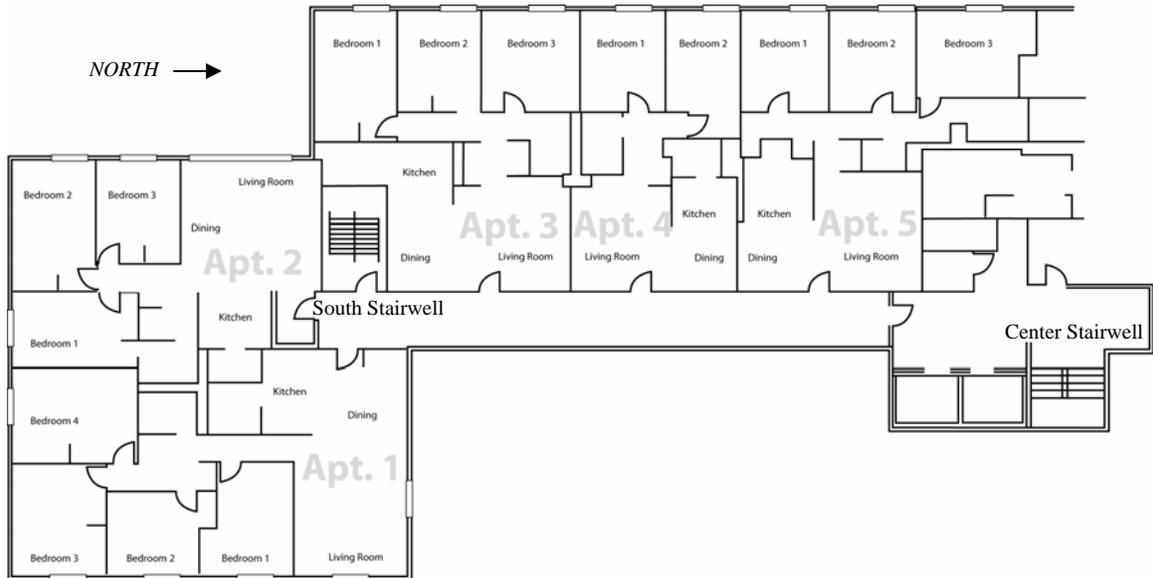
Floor Plan typical of floors 3, 10 and 15 (Left Half of Building)
